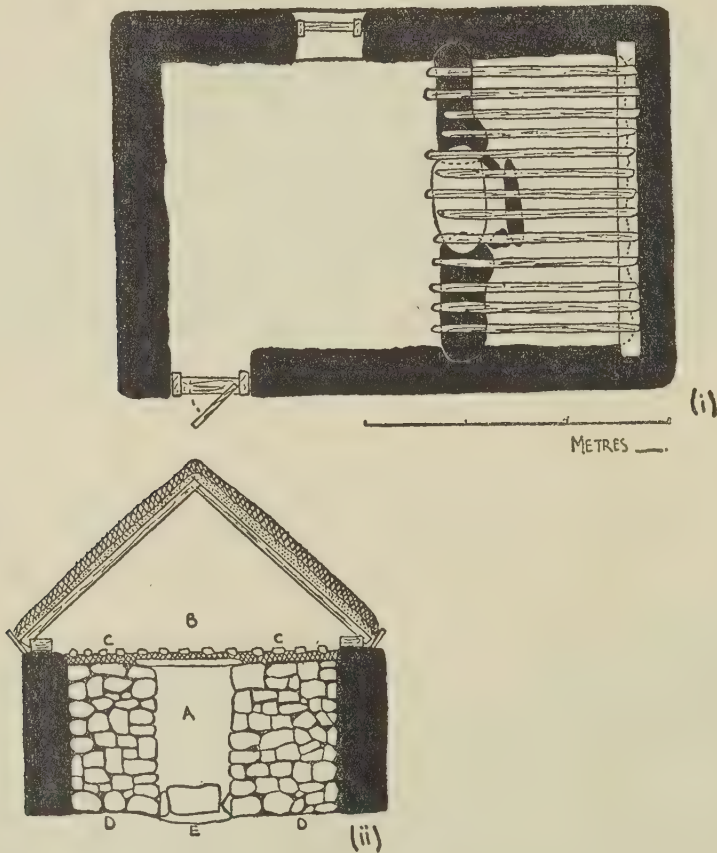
PLAN AND SECTION OF FAEROE KILN-HOUSE
